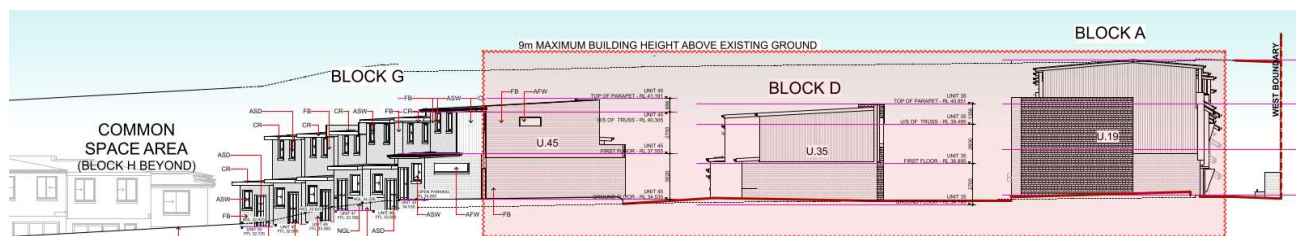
Proposed North Elevation facing the proposed Residential Flat Building.
